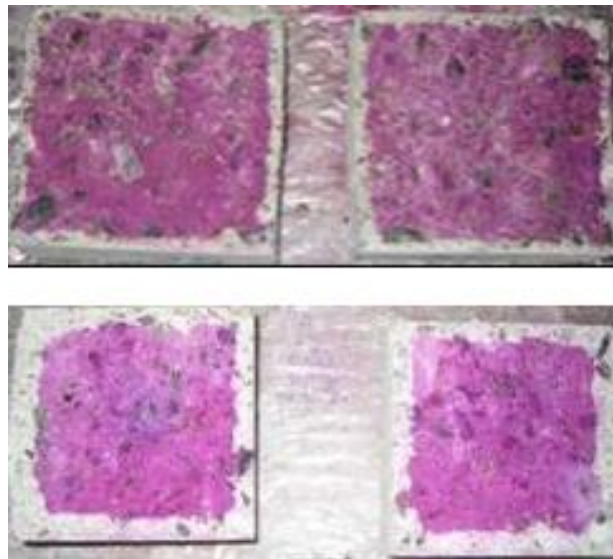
Sheltered concrete specimens for carbonation field test (Publication II).
